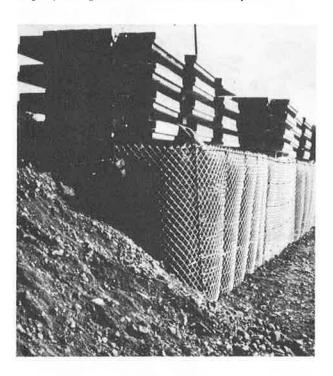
LOAD TESTING TEST WALL NO. 1
